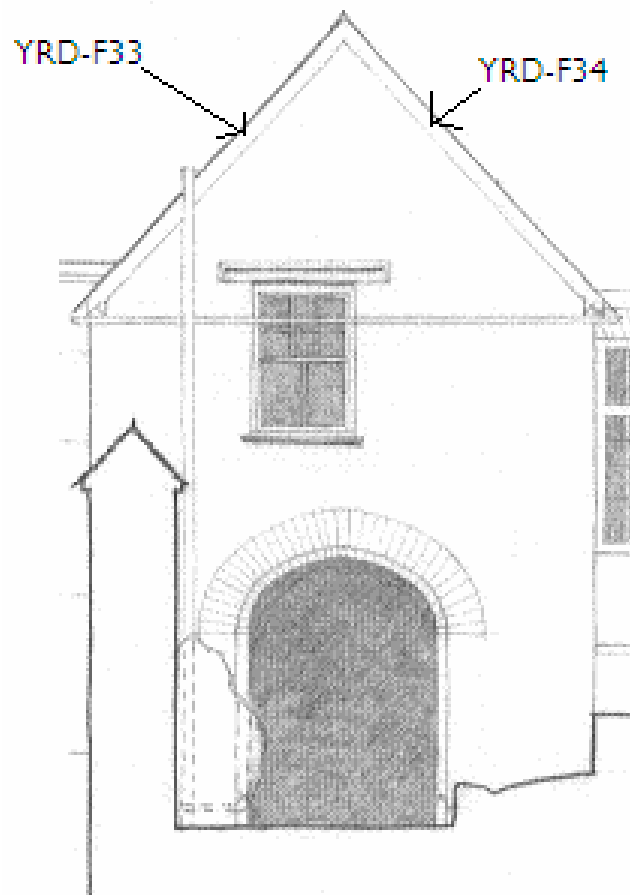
West-facing section D–D through the porch, showing the location of samples YRD-F33 and YRD-F34 (Architecton, position of section shown on Fig 16)
